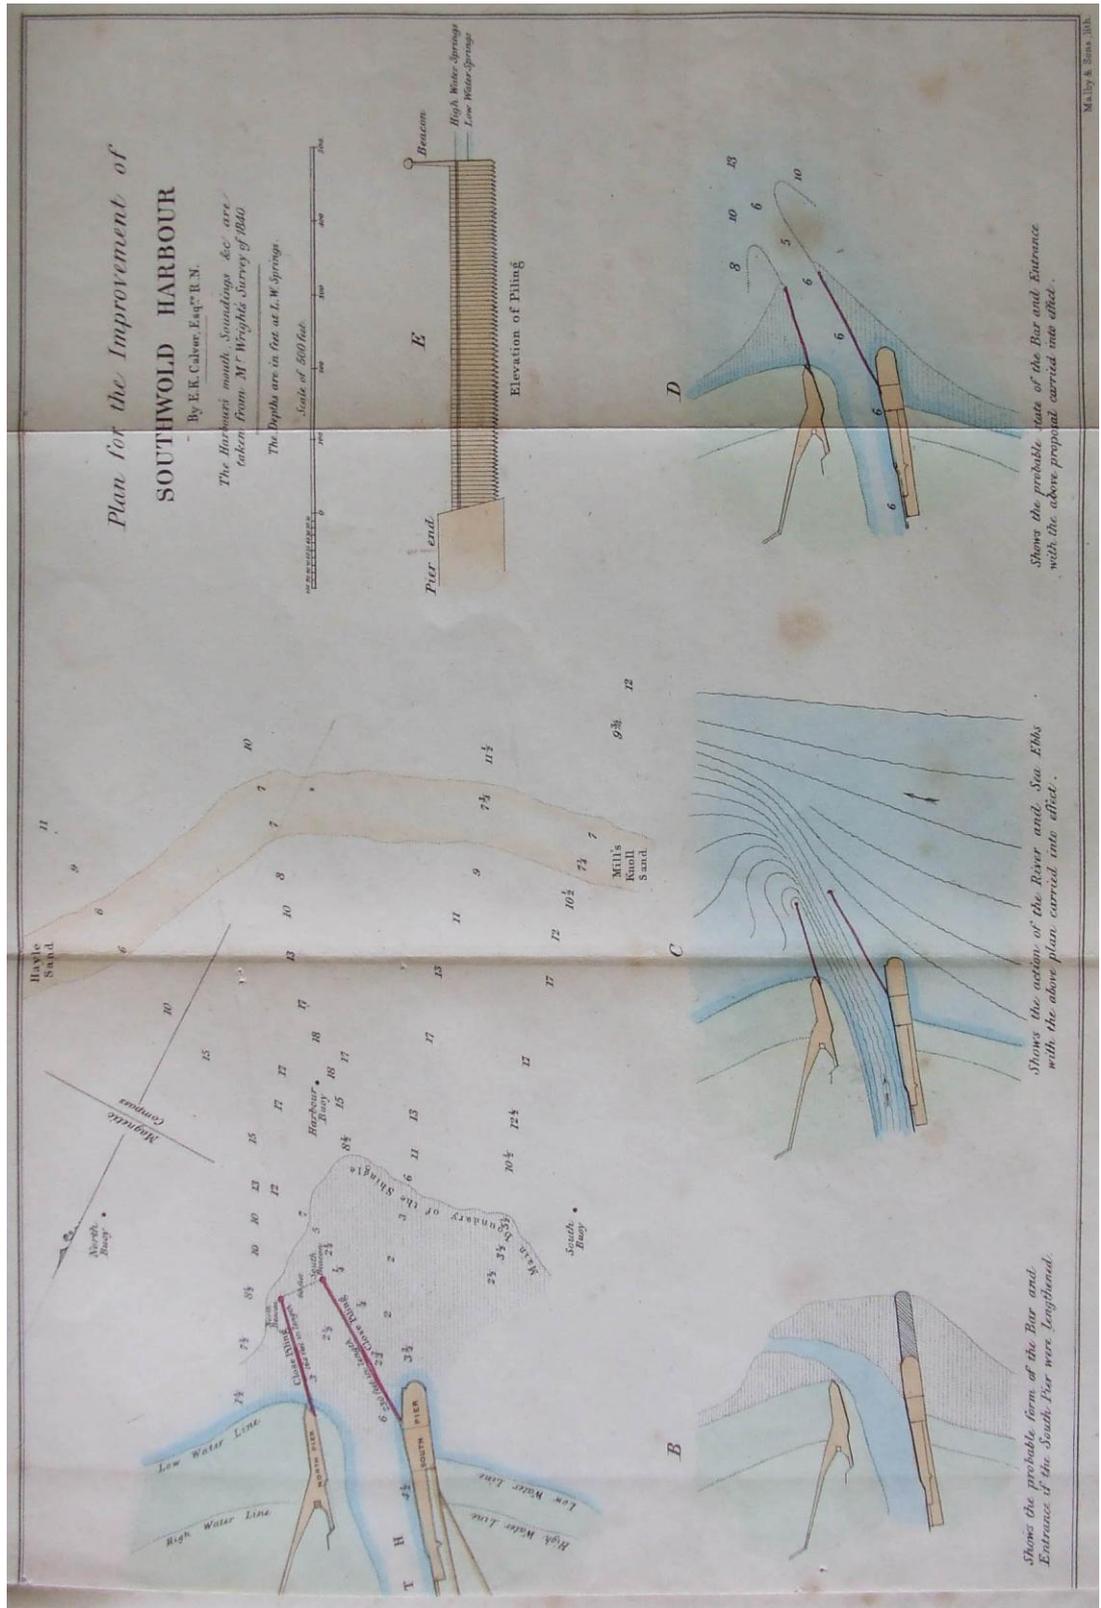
, Calver's proposals of 1844 for extending the piers with walls of close piling. Note the drawings suggesting different bathymetric outcomes with various pier arrangements (Sufflok Record Office, Ipswich Branch 627.3 1844)
